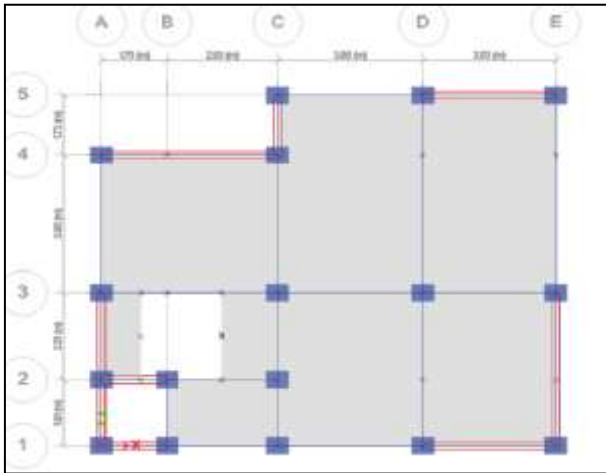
model (2) Plan view of G+20 Residential building model with shear wall
